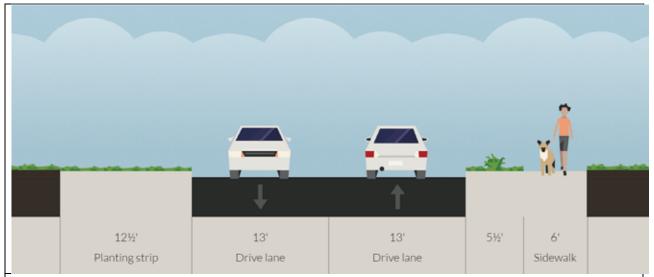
Proposed Configuration - Old Oaken Bucket Road - Central Street to Mt. Blue Street
